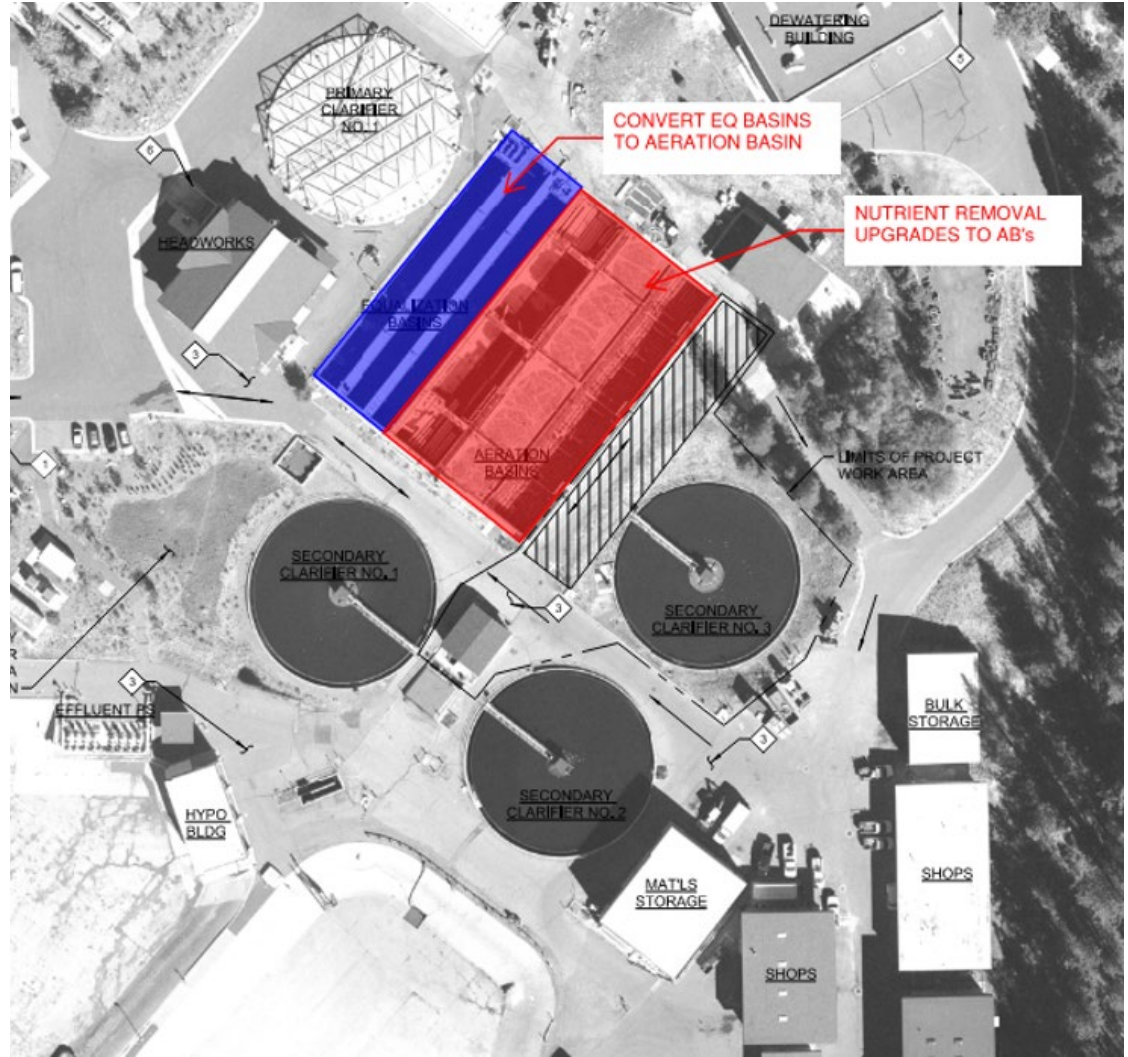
Alternative 6D – Conceptual Treatment Layout
